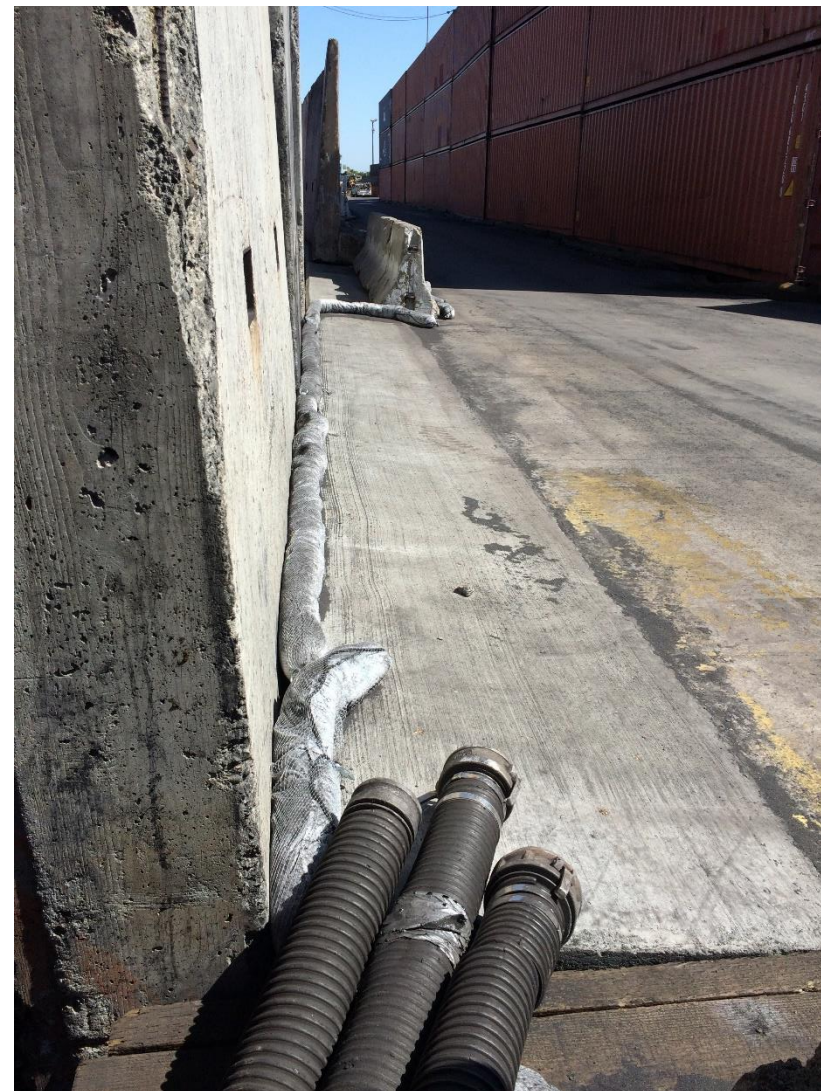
Looking north along western alley of secondary storage area: new concrete extending road in an area that was formerly gravel and timbers.
